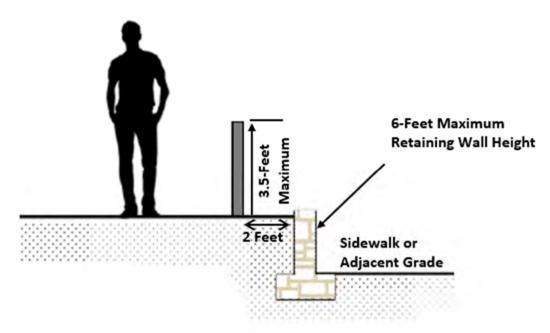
Measurement of Retaining Wall and Fence Height located within the Front or Street Side Setbacks
